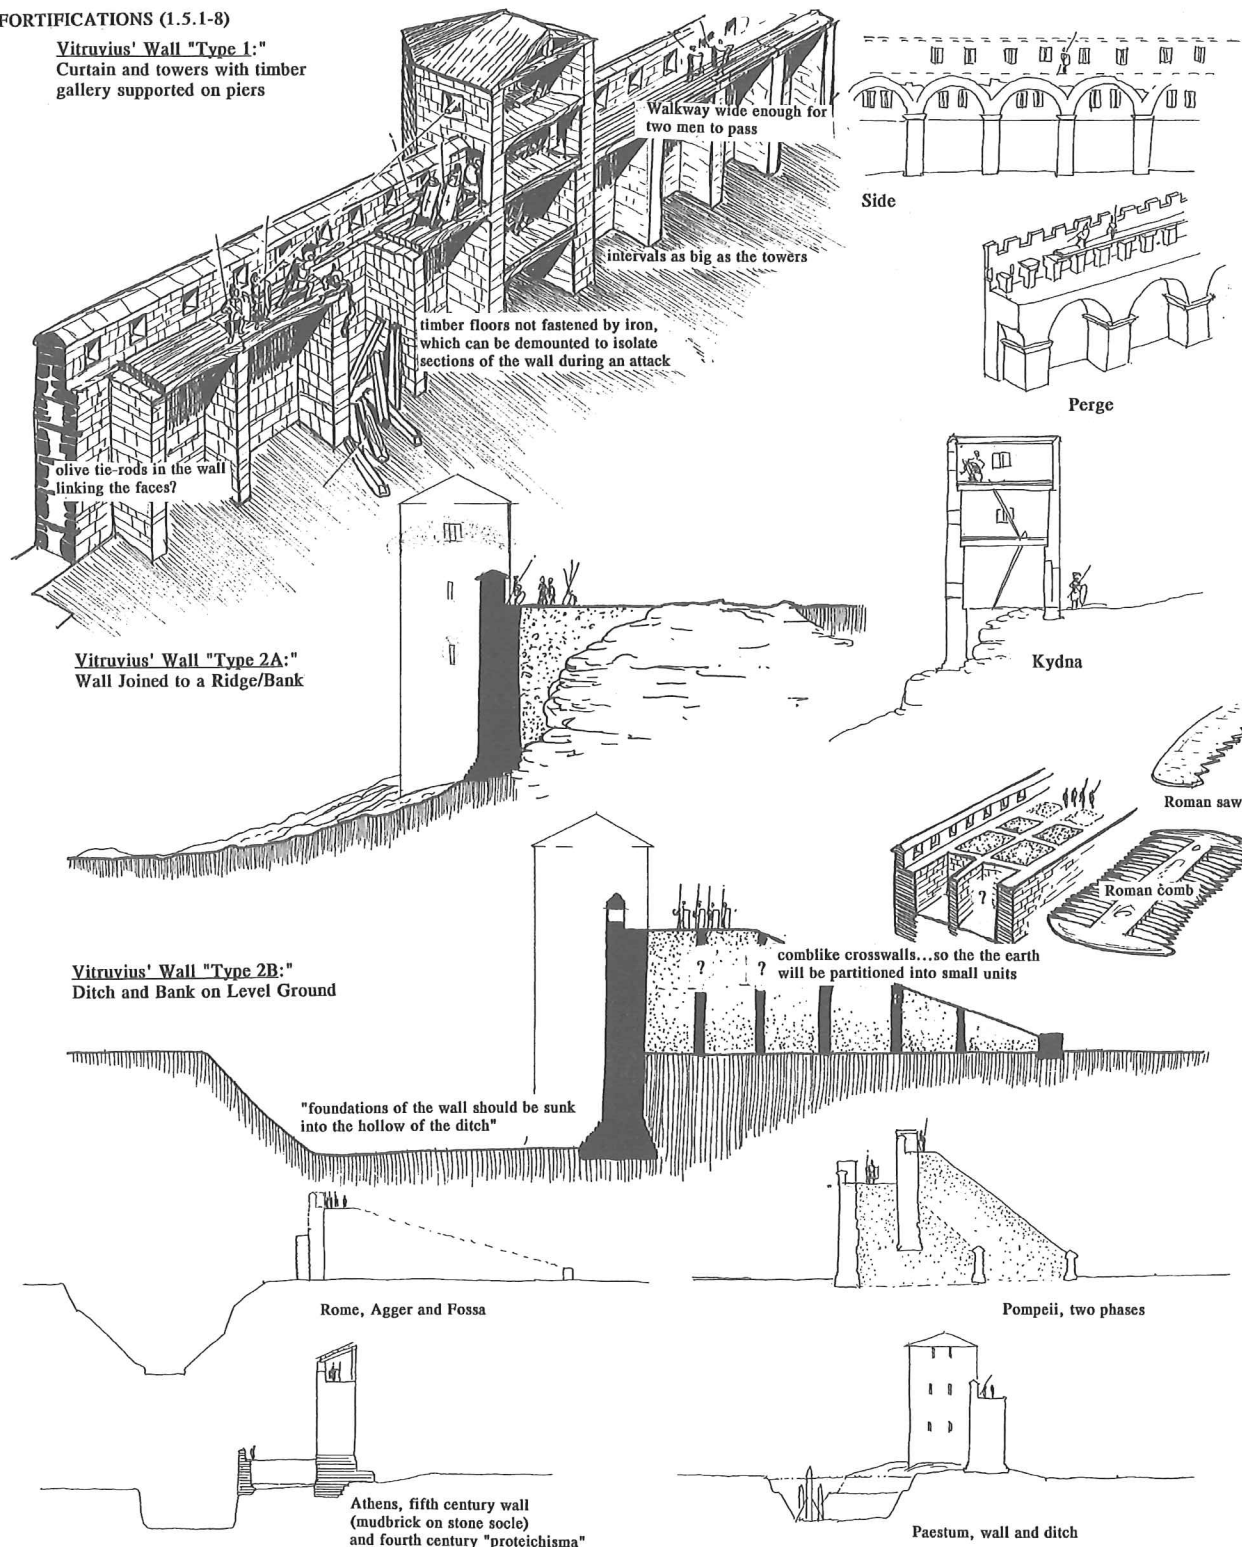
Fortifications: Vitruvius's Walls Type 1, Type 2A, Type 2B (1.5.1-8).
